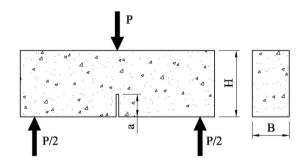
Three-point bending tests of snow beams: geometrical dimensions of the specimens.
